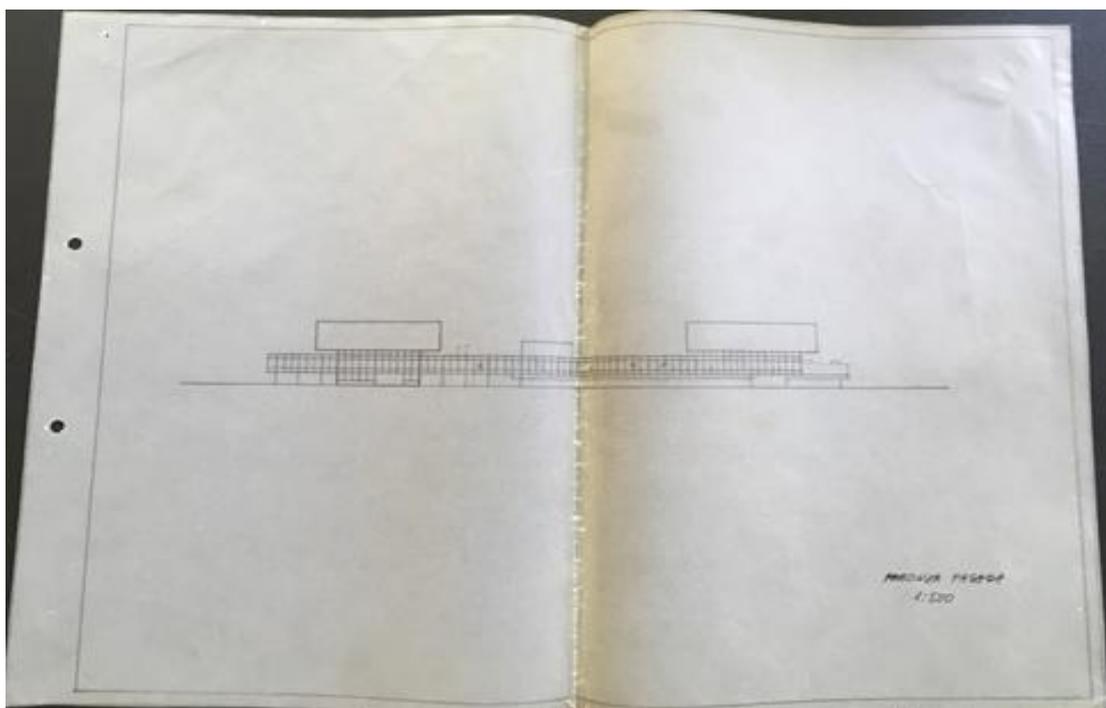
Unsigned drawings: proposed East elevation of the Museum with a second Cube (Author's photo from the HMBiH Archive).
